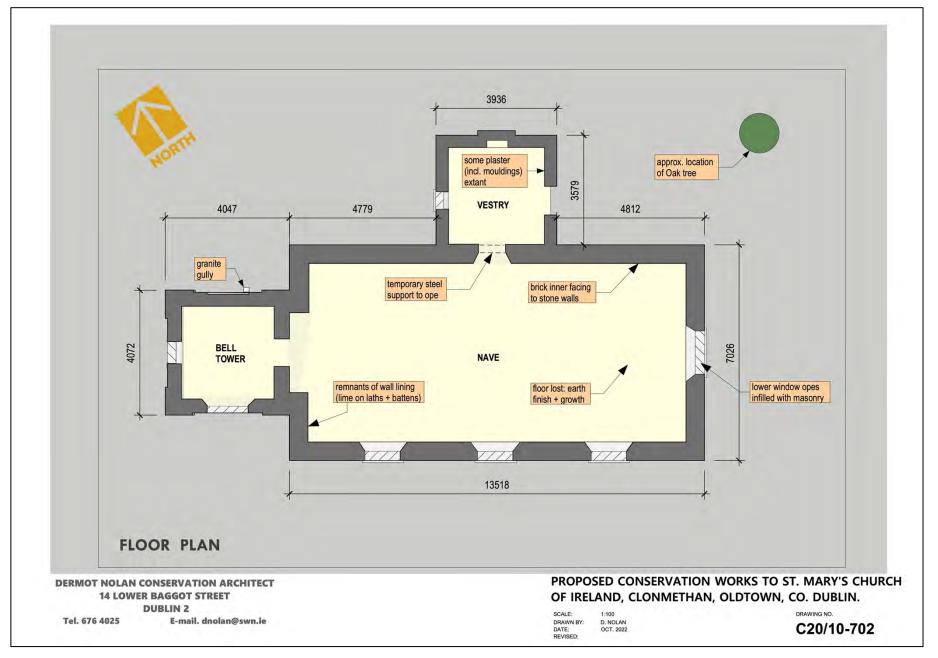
Floor plan of St Mary's Church (Nolan 2022).
